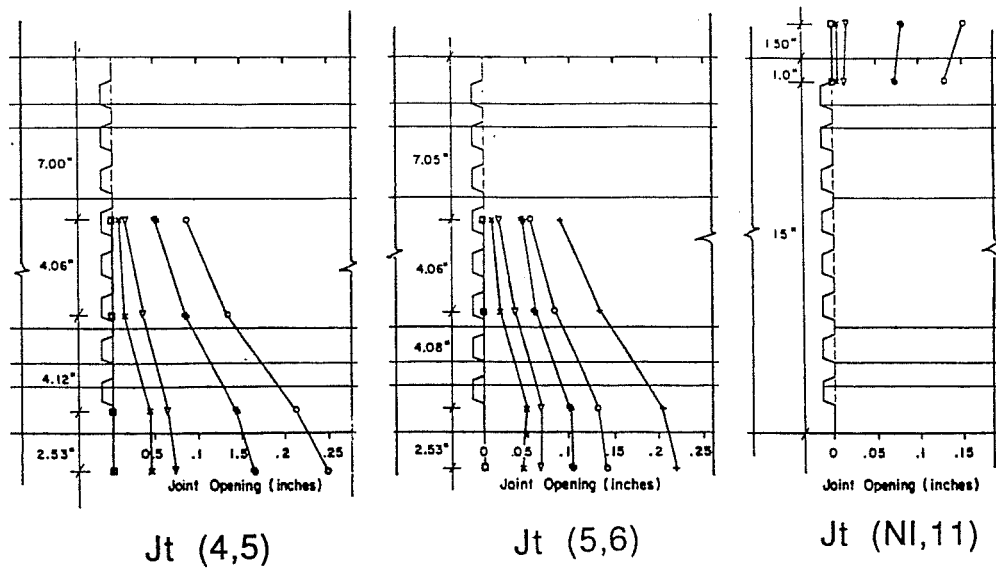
North Span Shear Strength Test: Joint Opening Behavior
